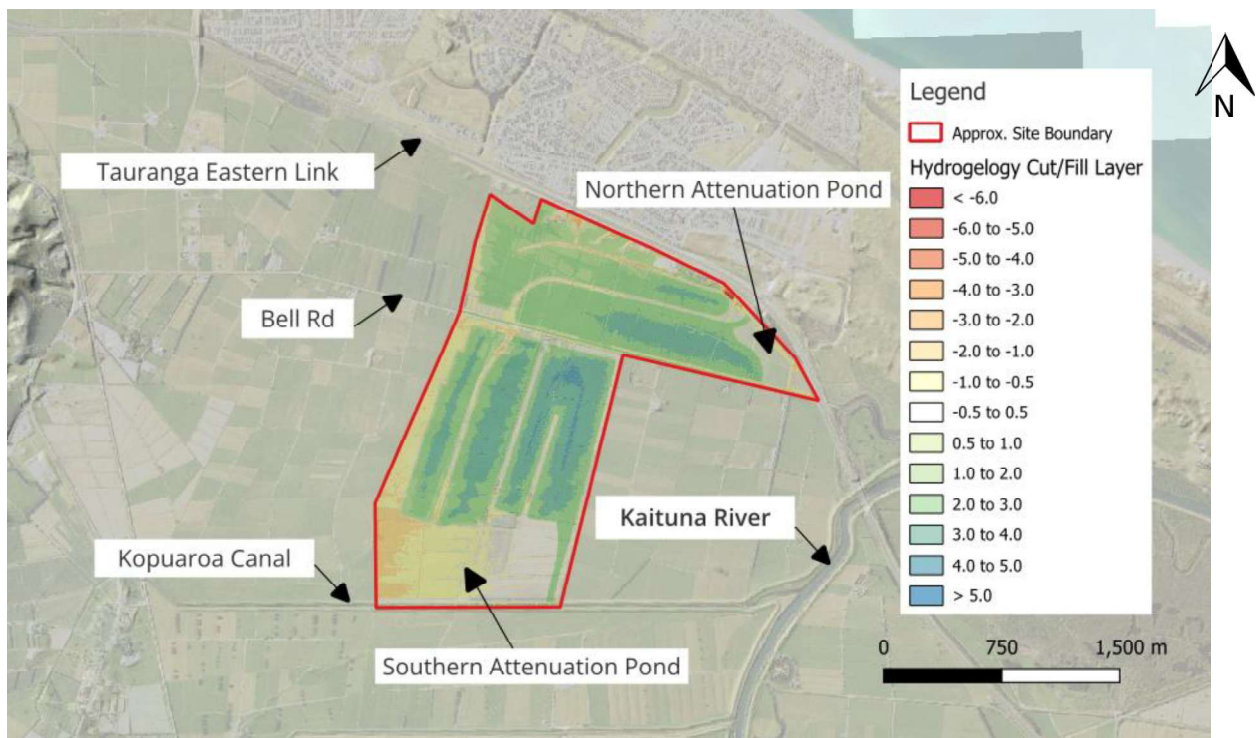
Site Plan with 5 m Contours Showing Hydrogeologic Model Cut - Fill Plan for the Site
